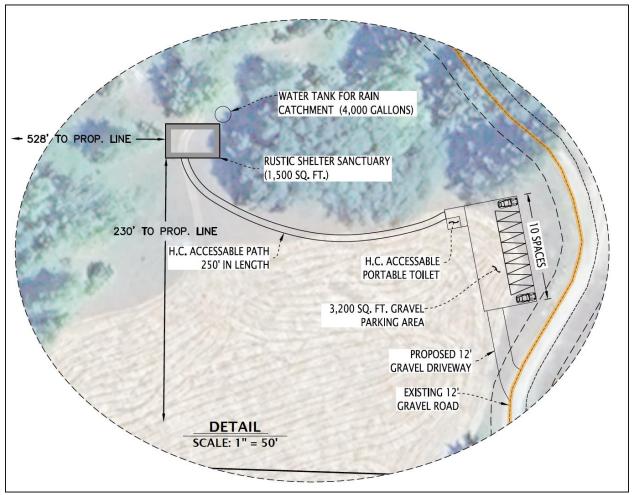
Project's driveway, parking lot, portable toilets, water tank, shelter pathway, and shelter accessory building sites, See Appendix A – Site Plan for scaled drawings.
